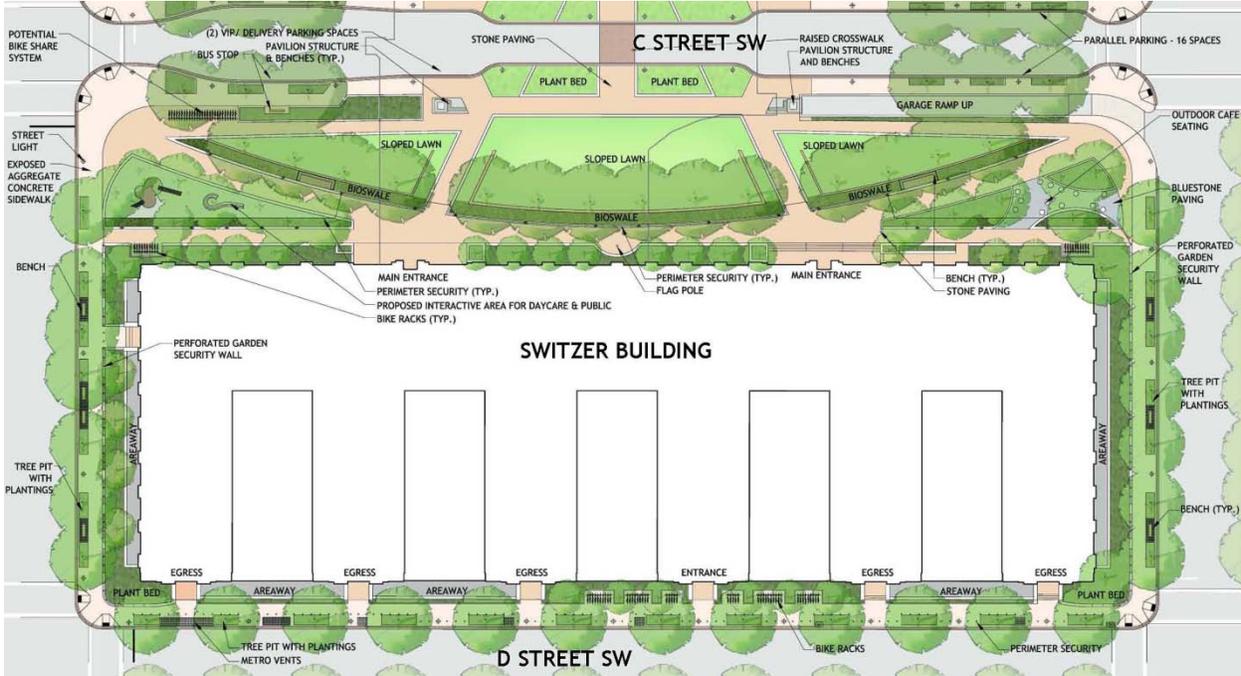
Site plan of proposed site improvements and perimeter security at the Mary E. Switzer Building
